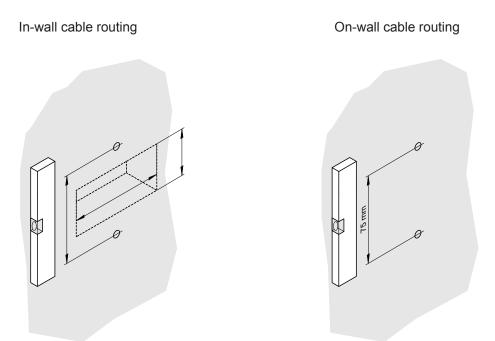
Drilling mounting holes and making cavity for in-wall cable routing
